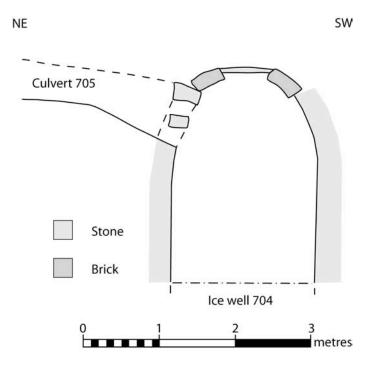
Reconstructed section through Ice well 704 and Culvert 705
